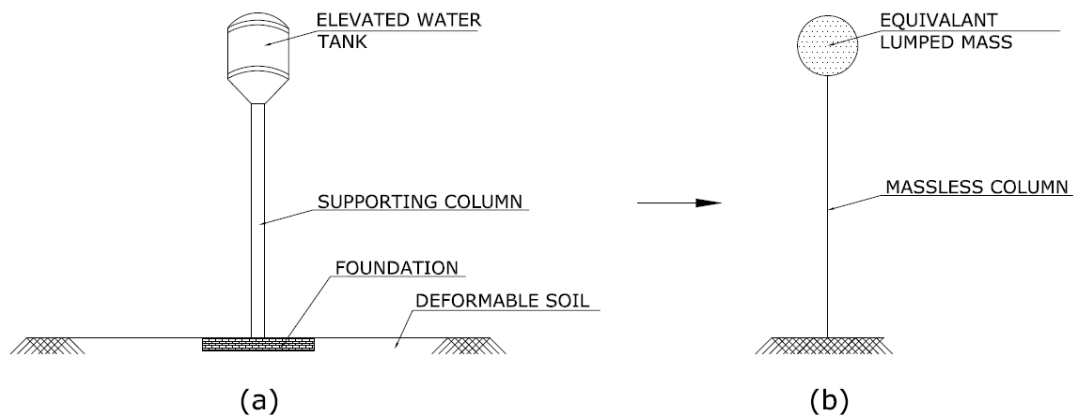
Elevated water tank (a) and its idealization (b)
